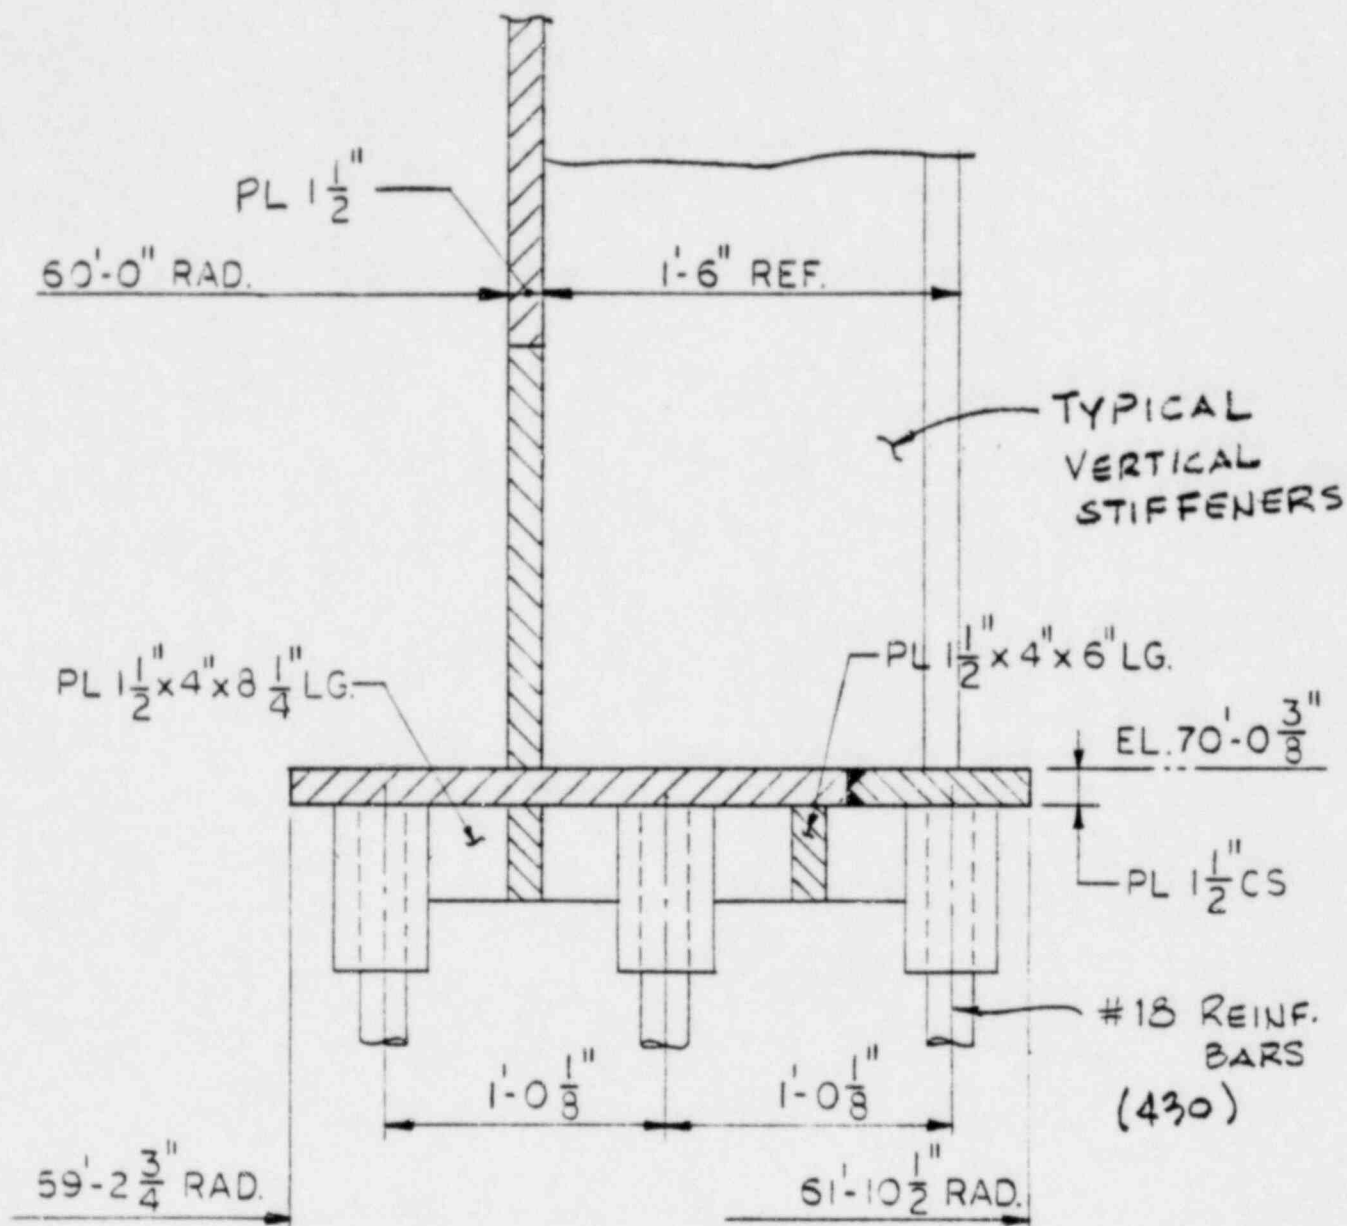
CONTAINMENT MAT JUNCTION DETAIL
